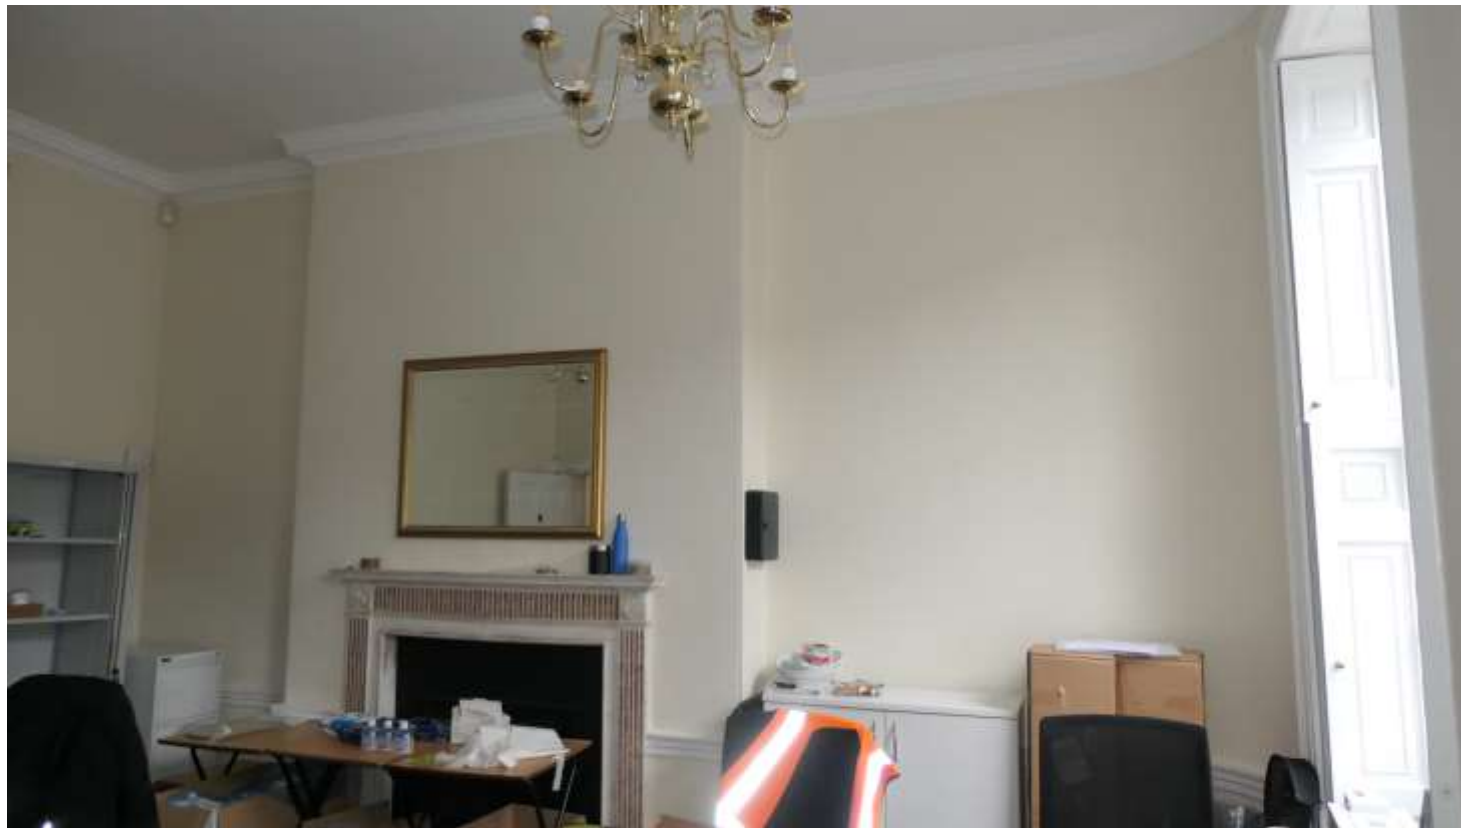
Good detailing to the ground floor rooms (the rear room pictured).
